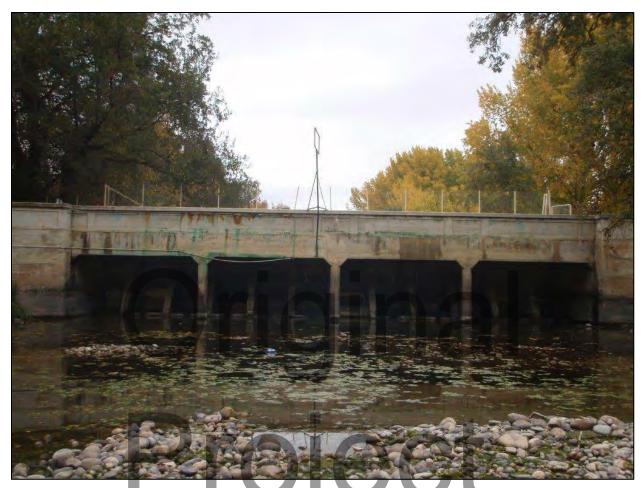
DOWNSTREAM SIDE OF EXISTING FRANKWOOD ROAD BRIDGE
